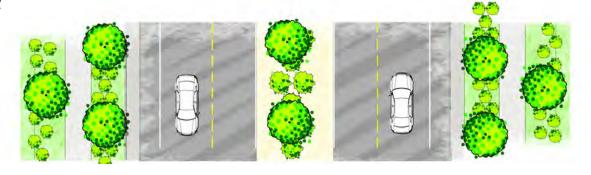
Empire Ranch Road Corridor-Residential/School & Park/Open Space (Major Arterial-Street Section N)
